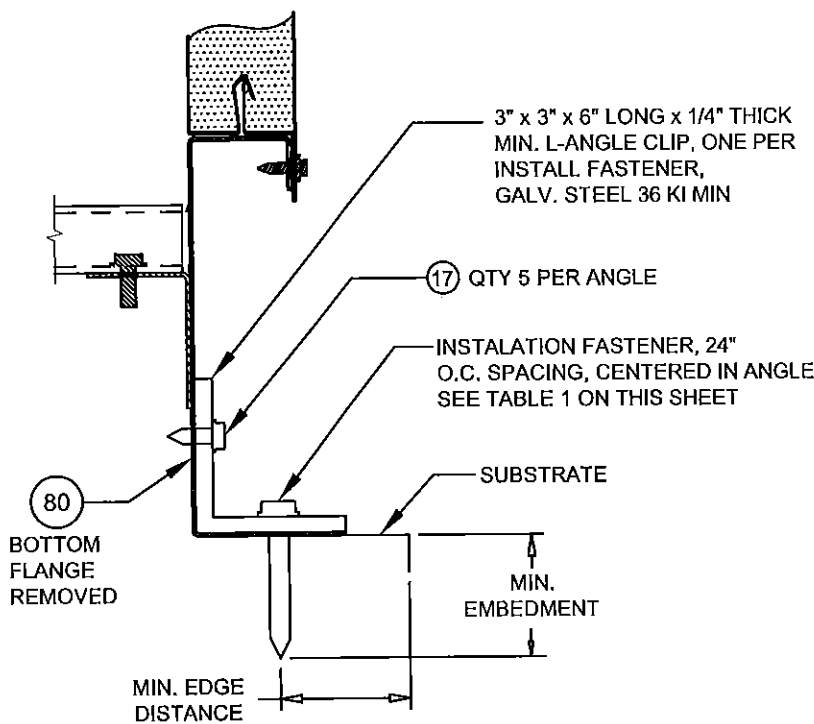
DETAIL C: TYPICAL ANCHORAGE AT ANGLE CLIPS
